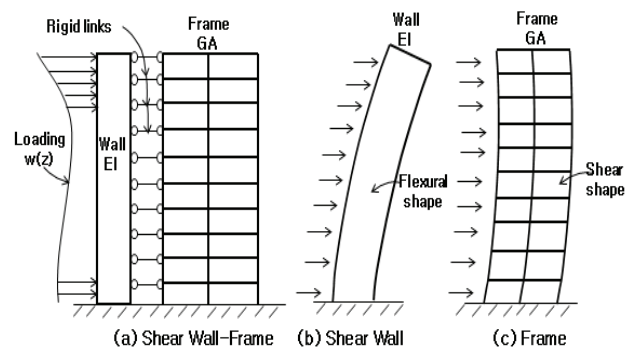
Shear Wall-Frame System Subjected to Lateral Load
